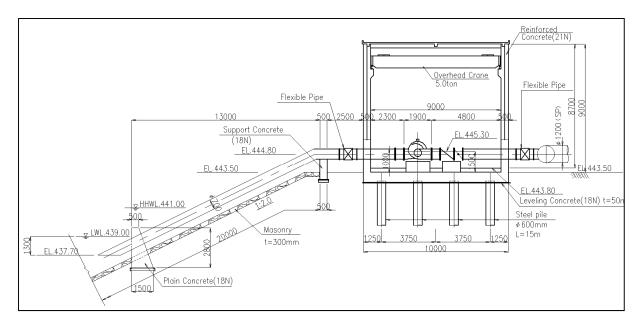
Plan and Section of Pump Station (Jebel Lado)
